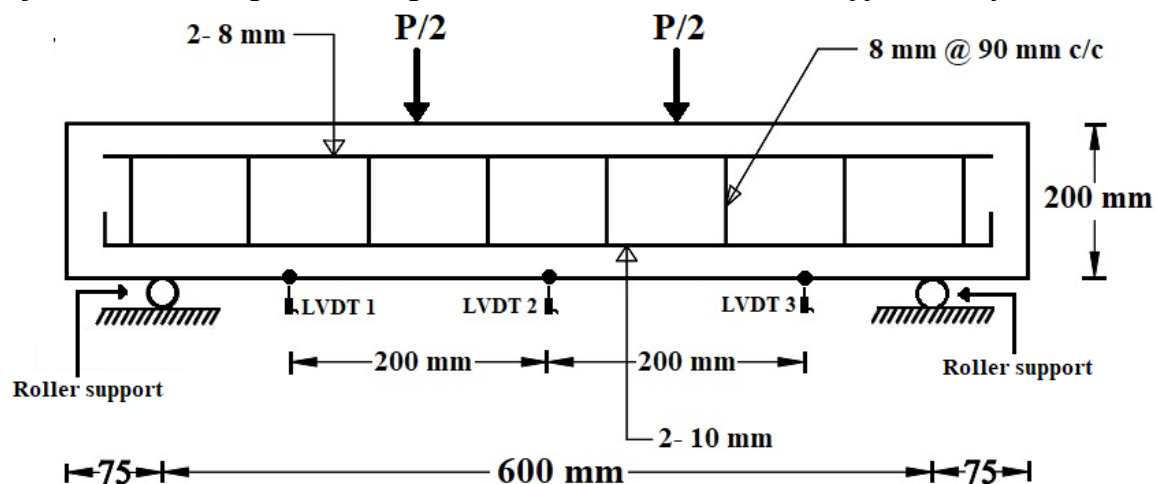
Reinforcement details of the RC beams and flexural test setup with LVDTs.
